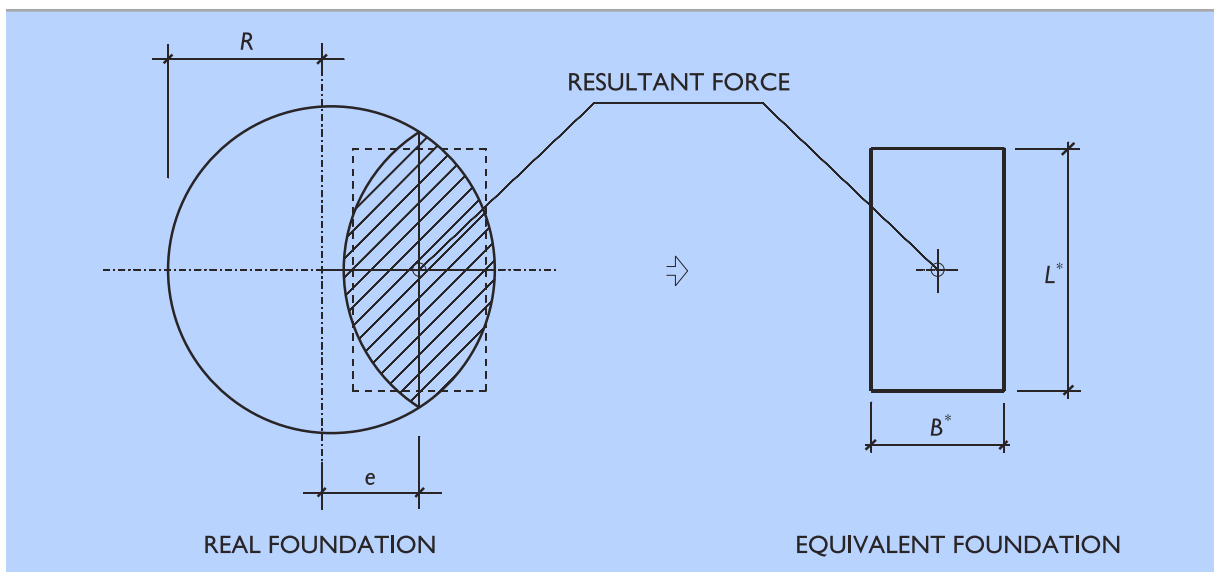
Rectangular Foundation Equivalent to a Circular Foundation with an Eccentric Load
